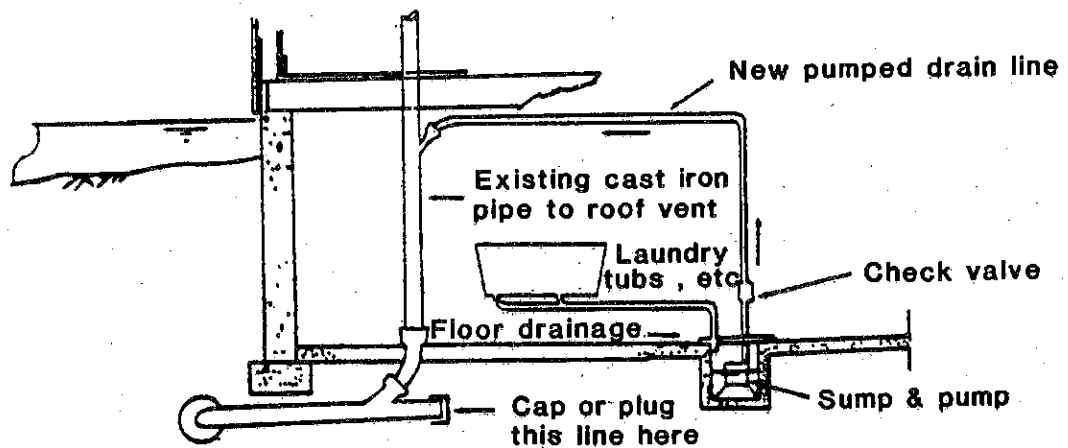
Elimination of Gravity-Flow Basement Drains
